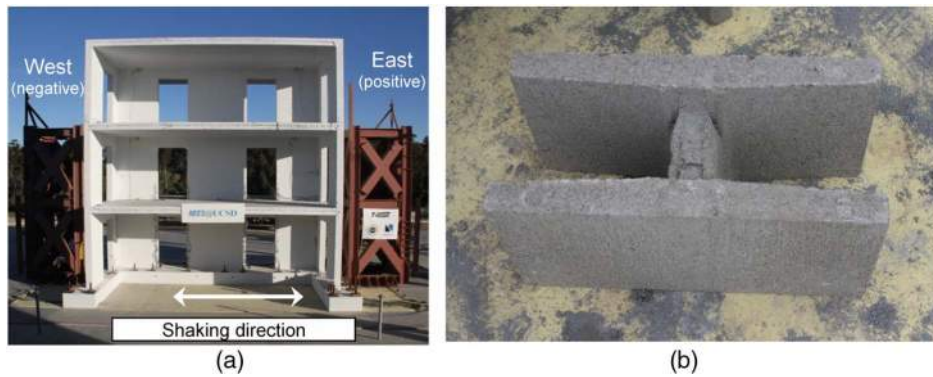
Test setup and typical concrete masonry unit: (a) test setup; (b) H-shaped CMU used in construction
